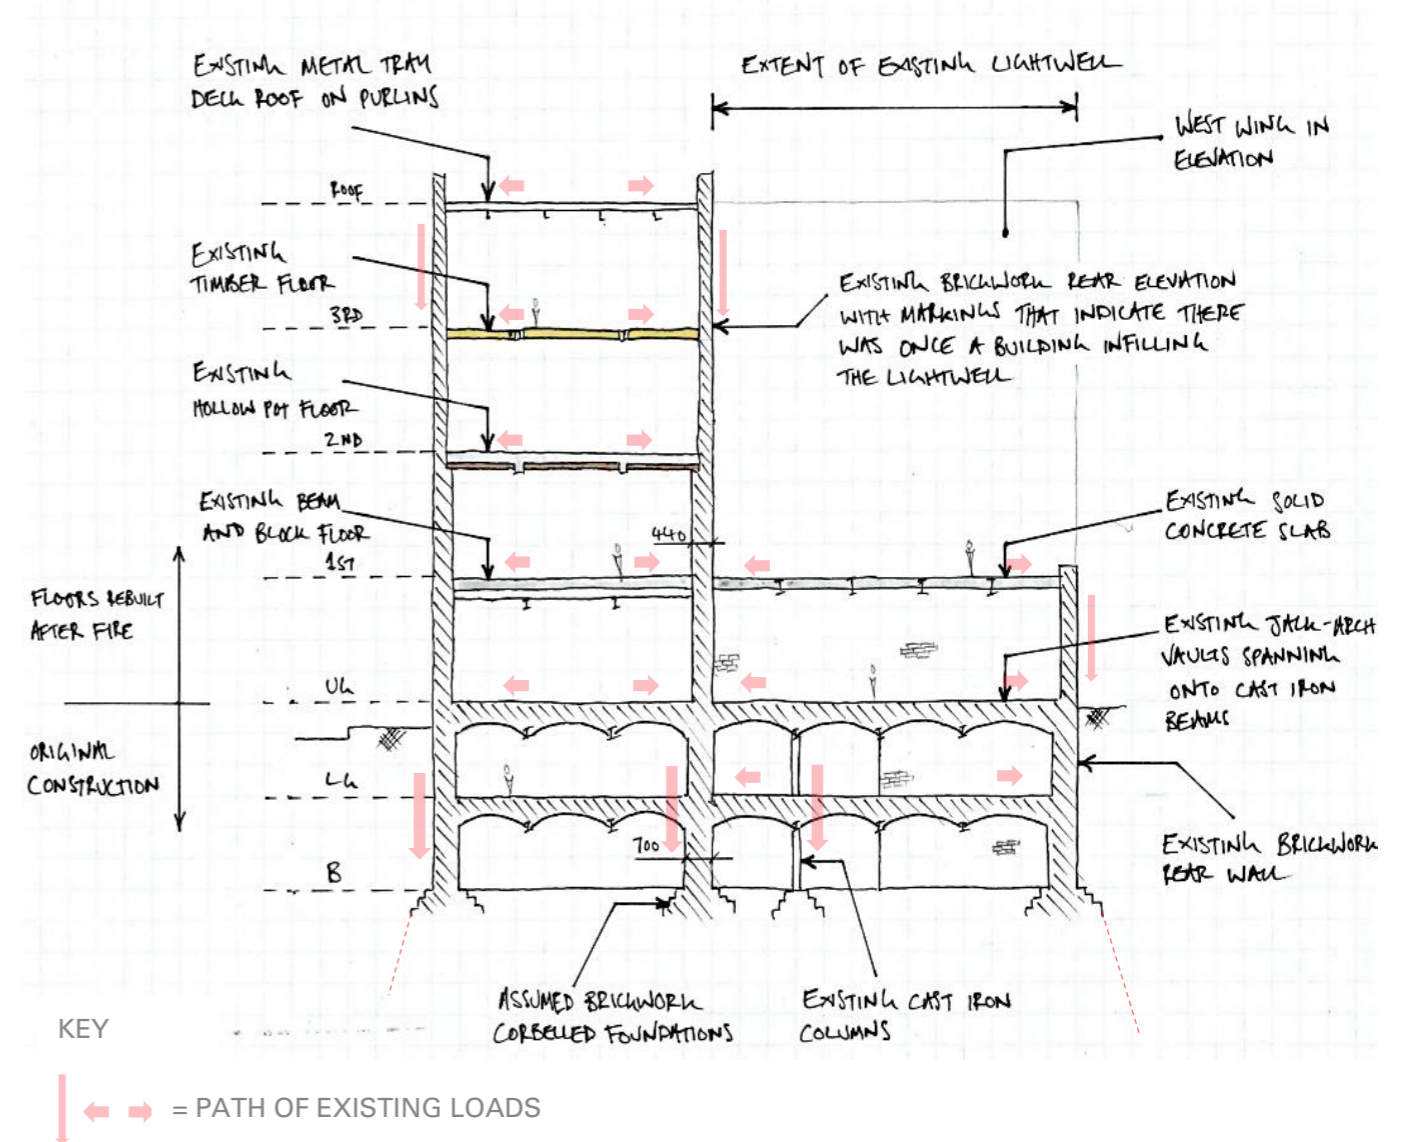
Existing Structure and Vertical Load Path of the Hop Exchange beneath and adjacent to the Lightwell
